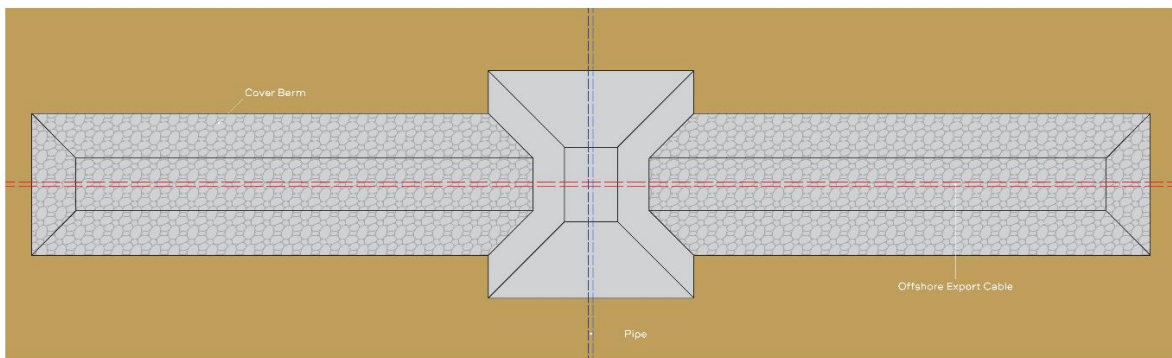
Plan View of Proposed Cable Crossing Layout
